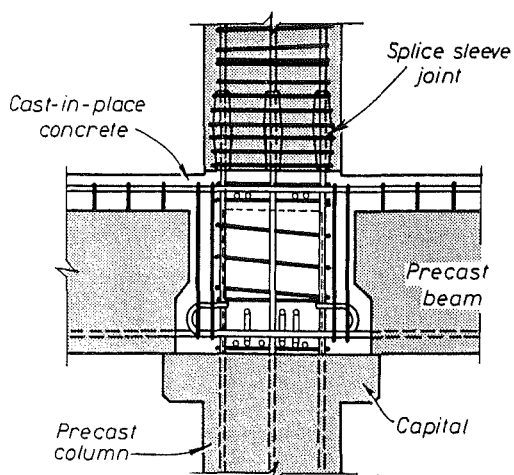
Anchorage Details Tested at the Beijing Institute for Architectural Design.
